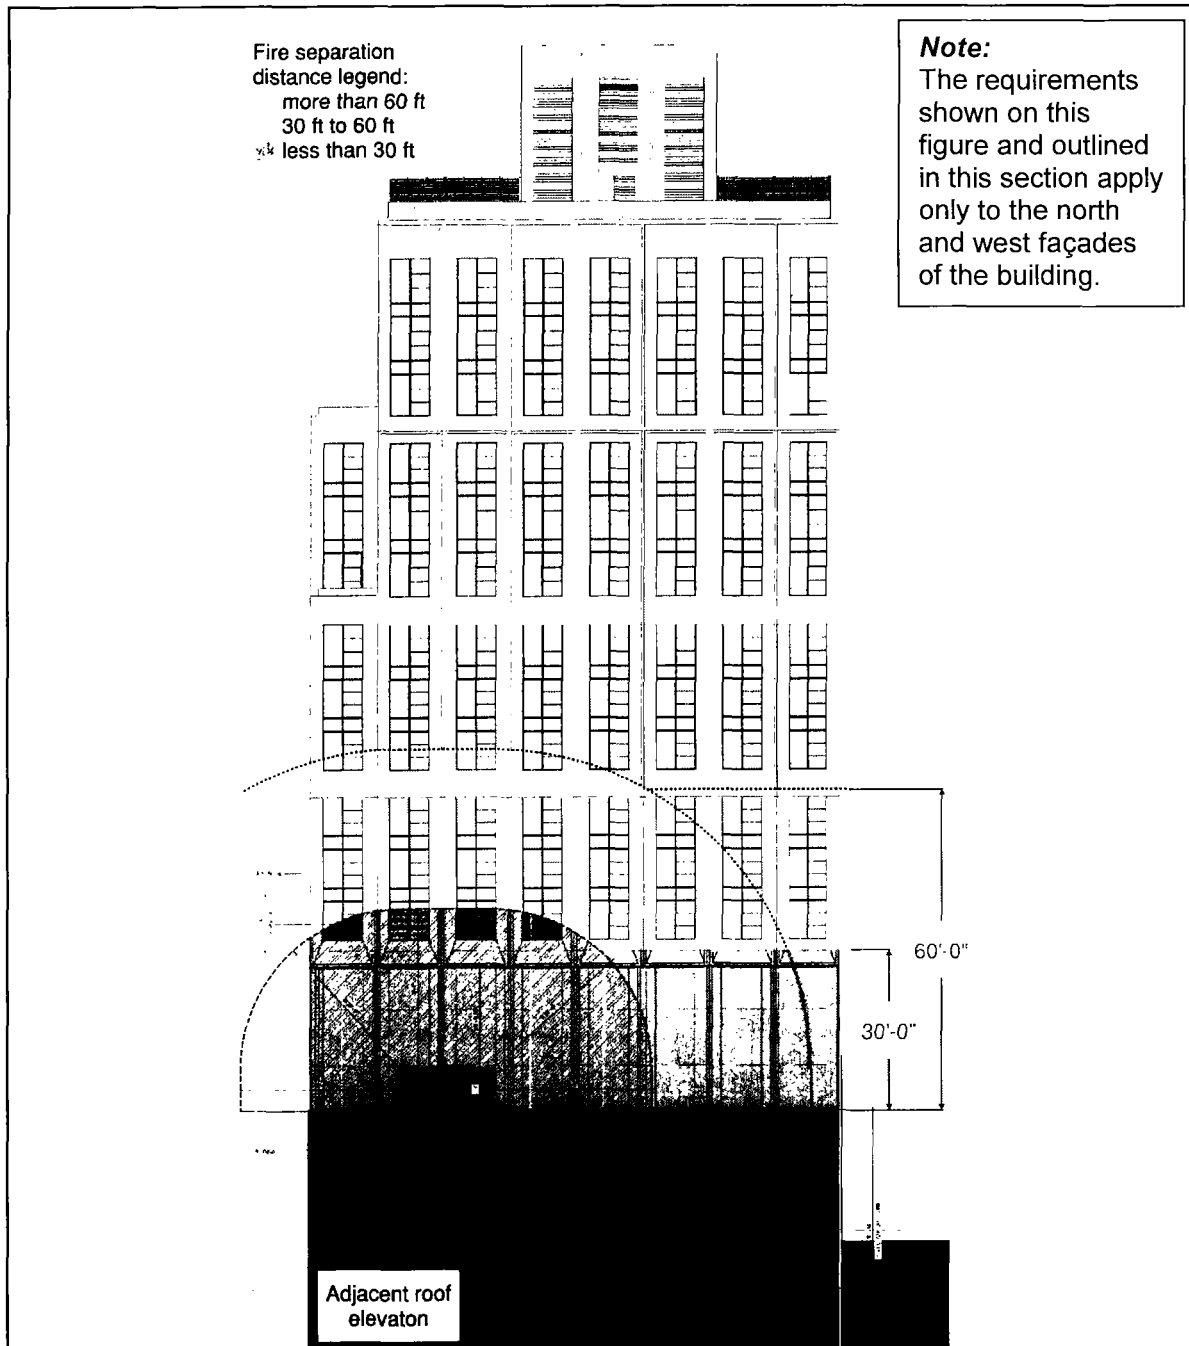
Exterior wall openings permitted by Buildings Bulletin 2015-17
